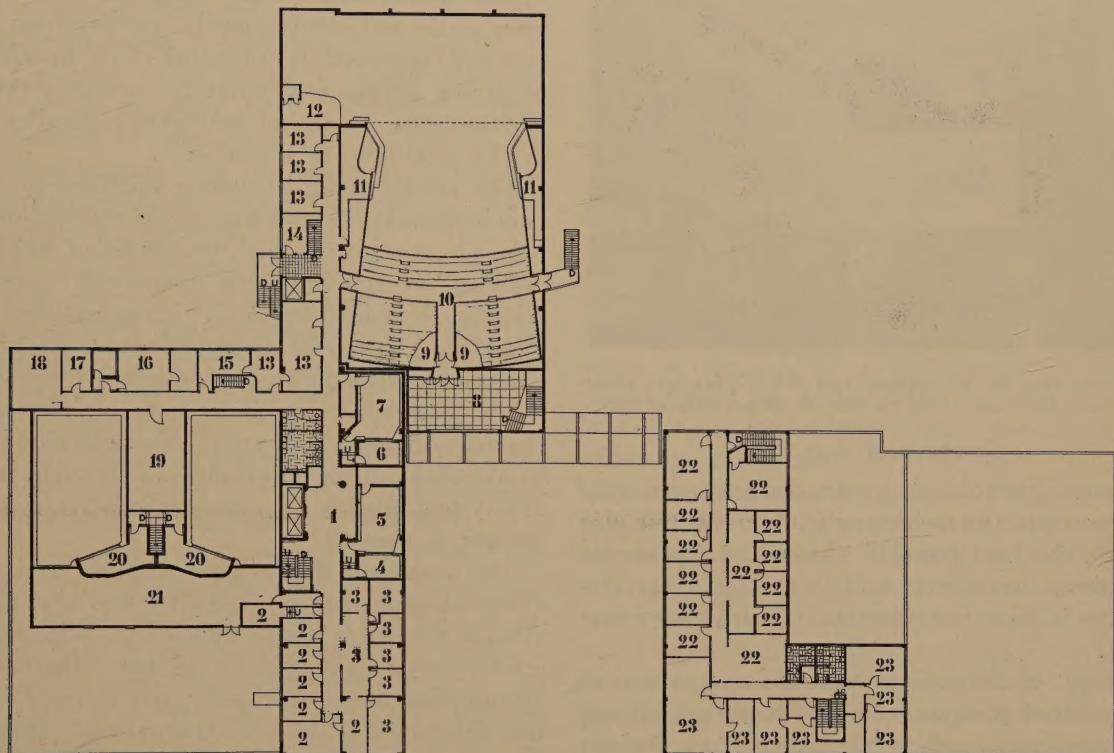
Second-floor plan of CBS Hollywood studio building showing the mezzanine section of the auditorium studio, the smaller studio units, the studio observation rooms, and smaller offices.
